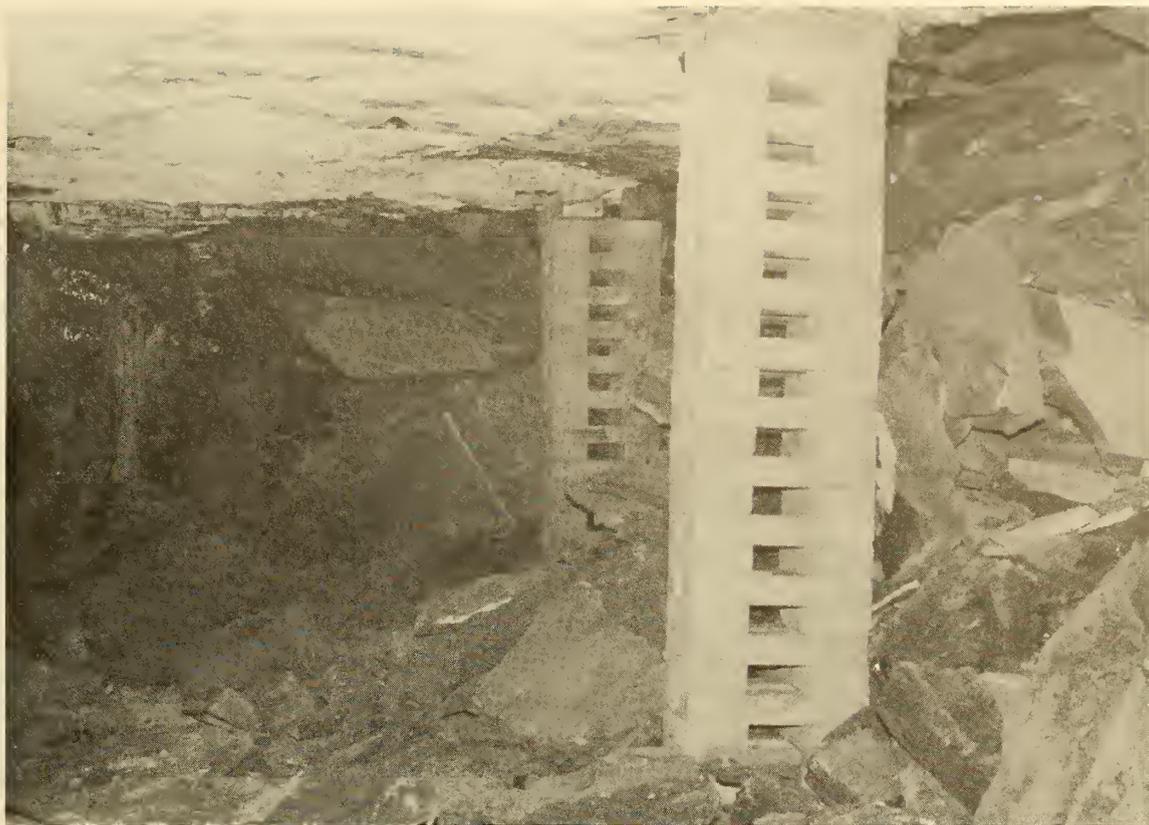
Tailgate supported with concrete cribbing after passage of longwall face. Alabama mine.
